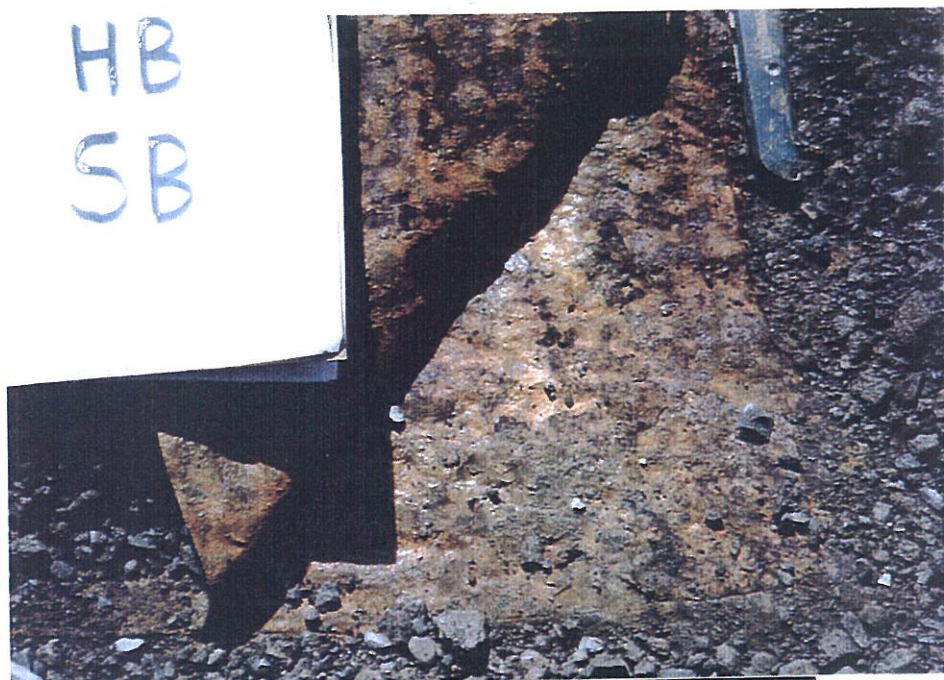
(top) - HB-SB geotextile before removal, with corner peeled back. Figure 5.25 (bottom) - HB-SB geotextile after removal, top face shown.
